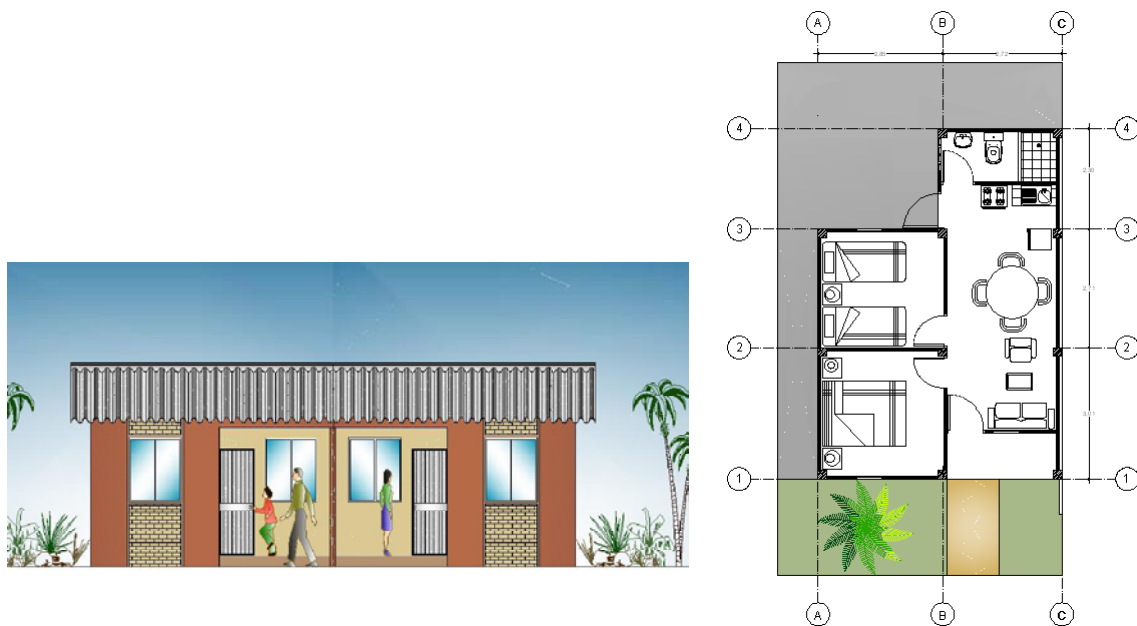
Façade of a semi-detached house and the corresponding plan of one housing unit.
